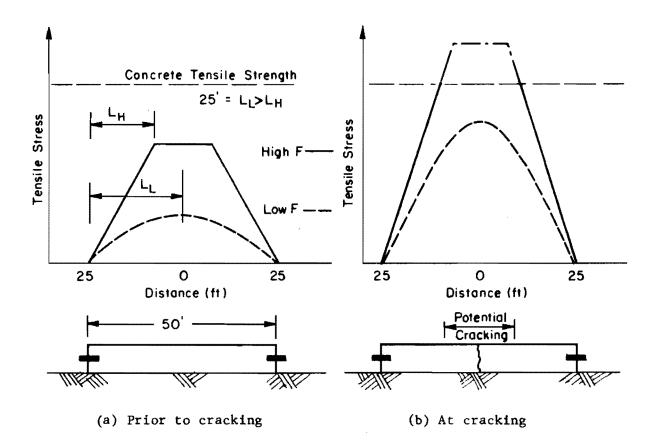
Longitudinal stress distribution in a concrete slab prior to and at cracking (Ref 2).
